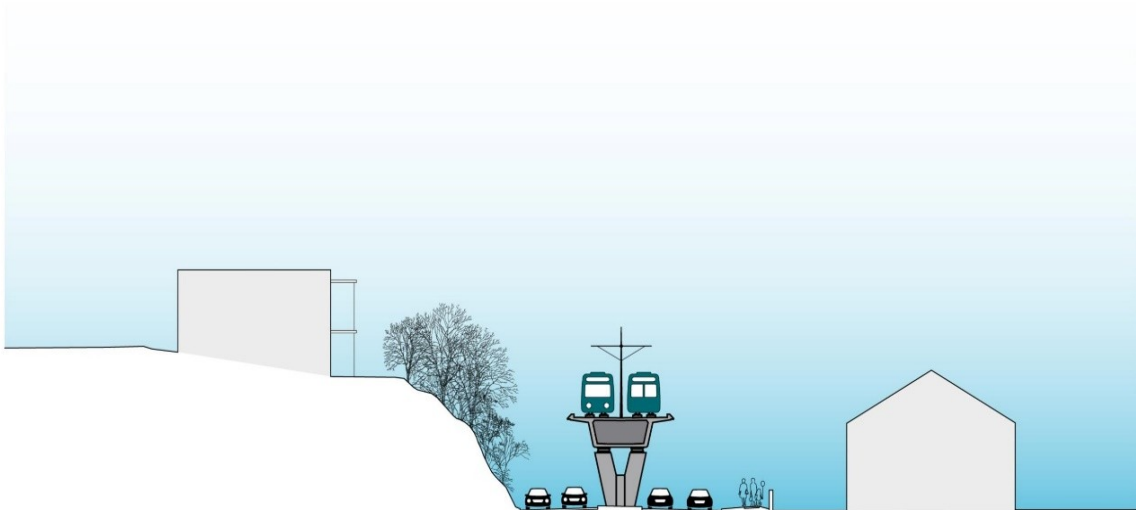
Design Option with Elevated Waterfront Station and Elevated Bridge Extension on East Riverside Drive, Facing Northwest
